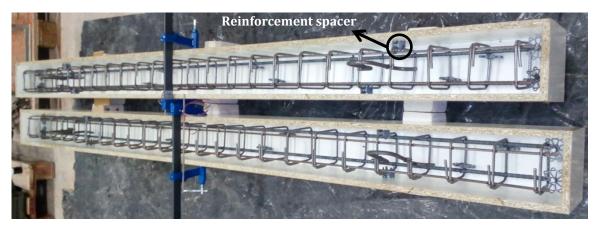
Installation of the steel reinforcement cages to the molds.
